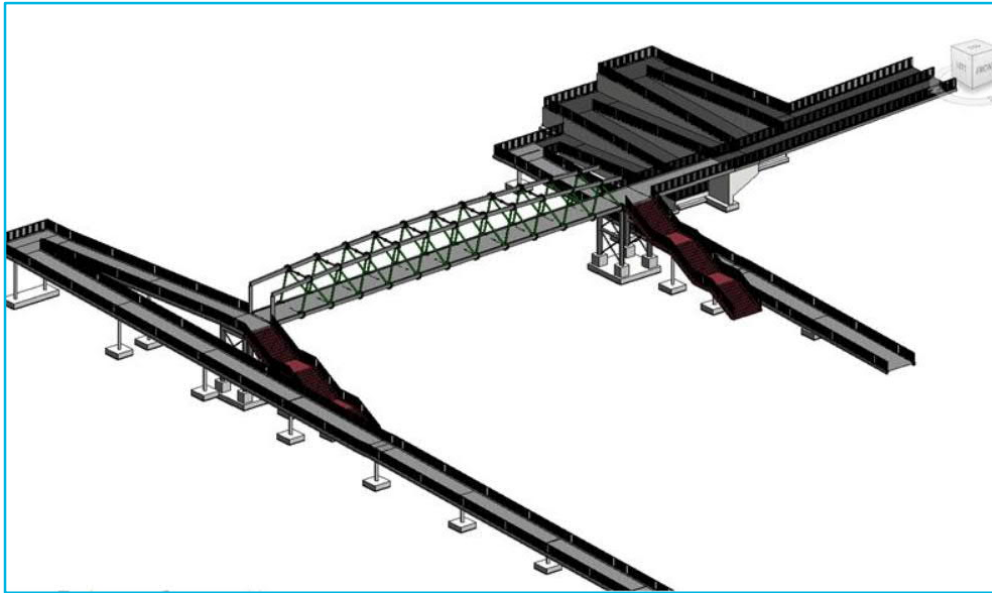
N4 Pedestrian Bridge 3D Interactive Model looking south east
